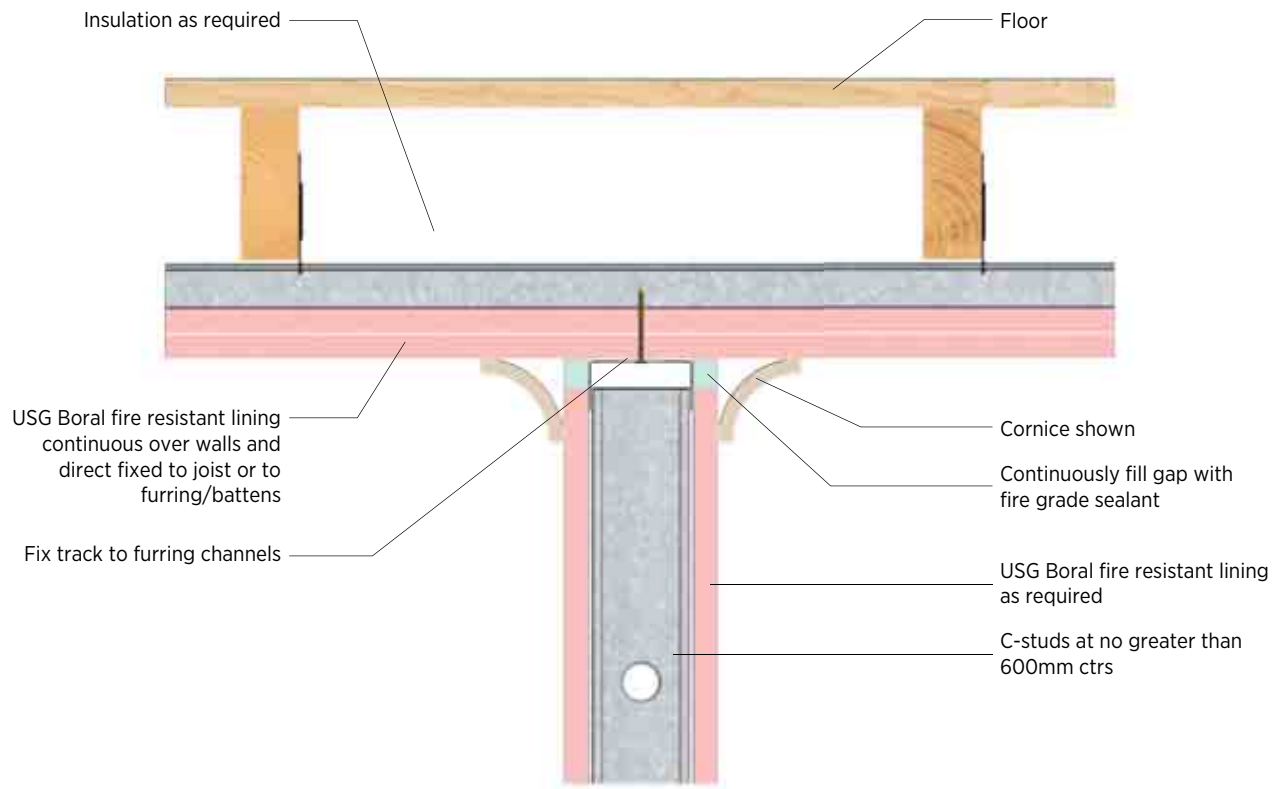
Fire Rated Wall to Fire Rated Ceiling Detail
